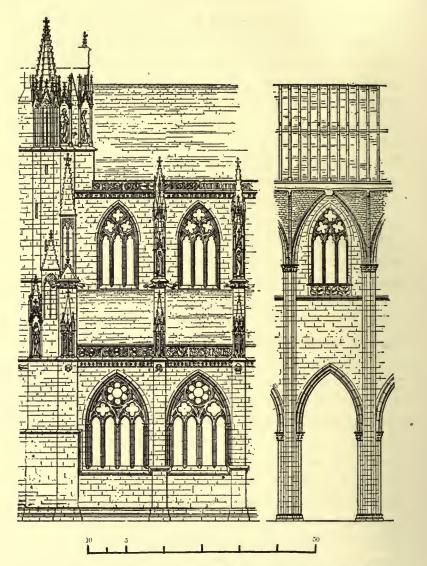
Freiburg-im-Breisgau, Germany: Minster. Detail of south flank and of interior. About 1240 A.D.
